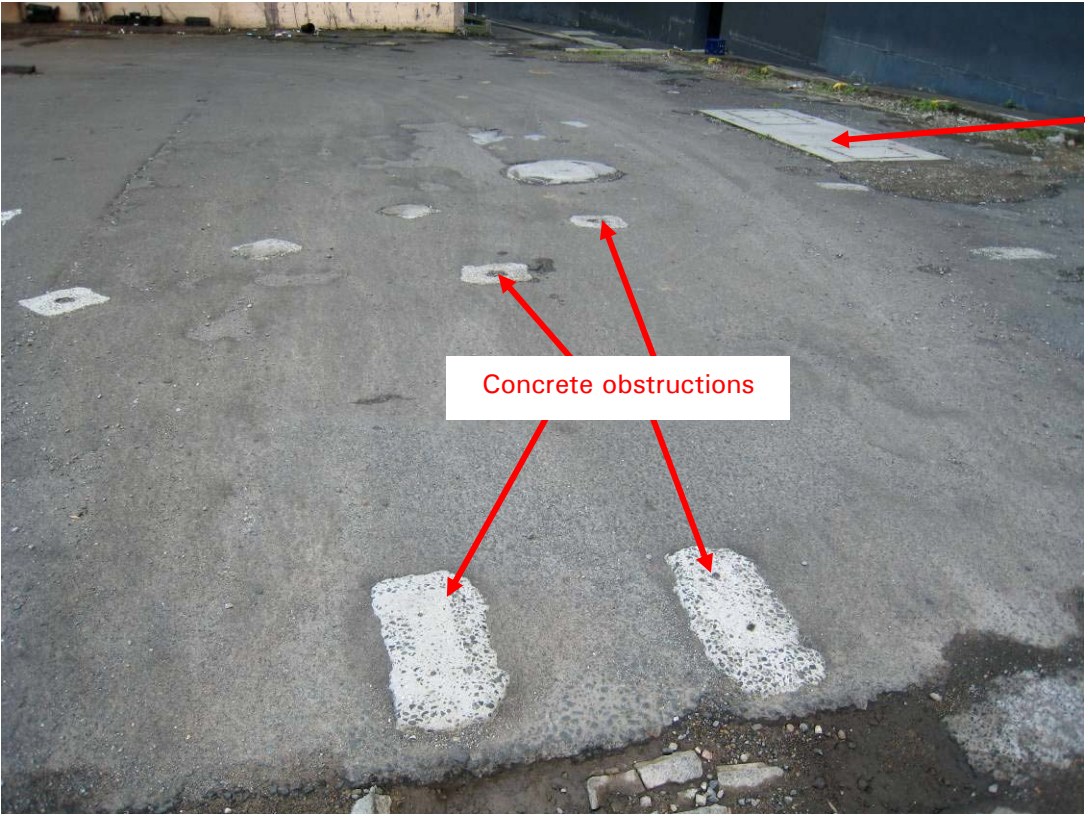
View showing selected concrete obstructions at ground surface inside site and inspection pit for buried services.
